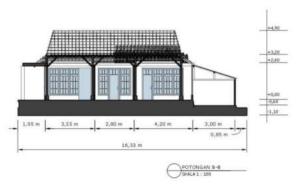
Section of a modern Madurese house building Source: Research team, 2023
